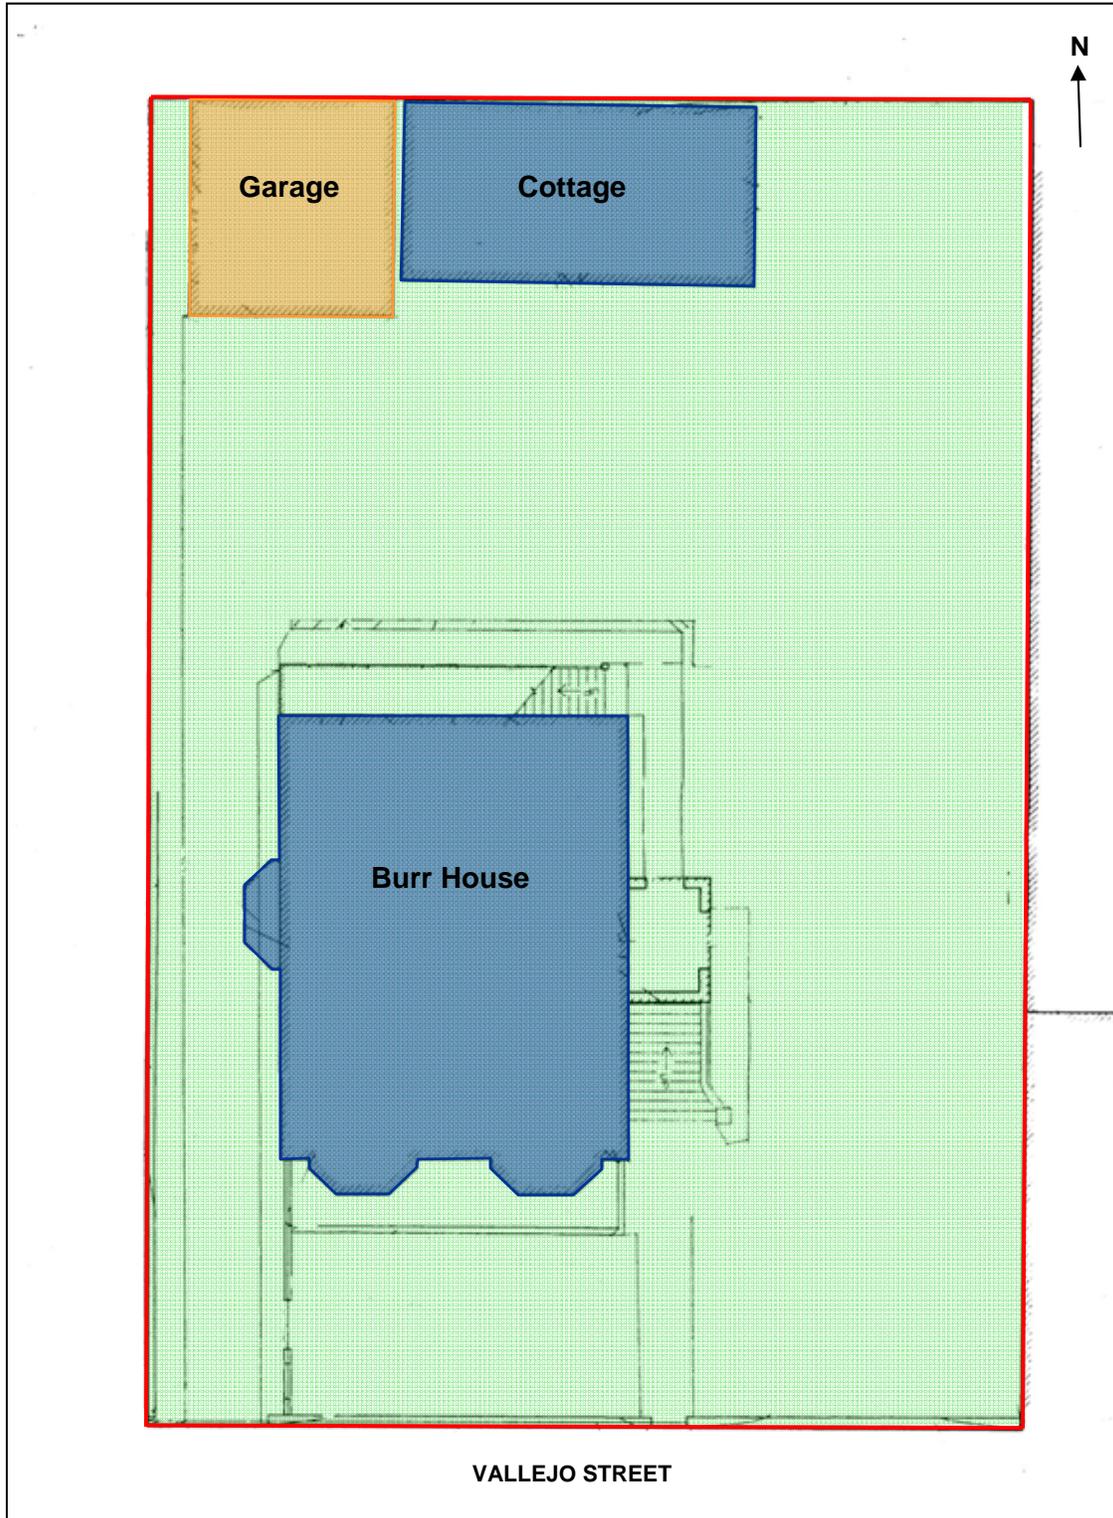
Detail of current site plan showing contributing and non-contributing buildings. Subject property is outlined in red. Contributing buildings are shaded blue, non-contributing buildings are shaded orange, and contributing garden setting is shaded green.
